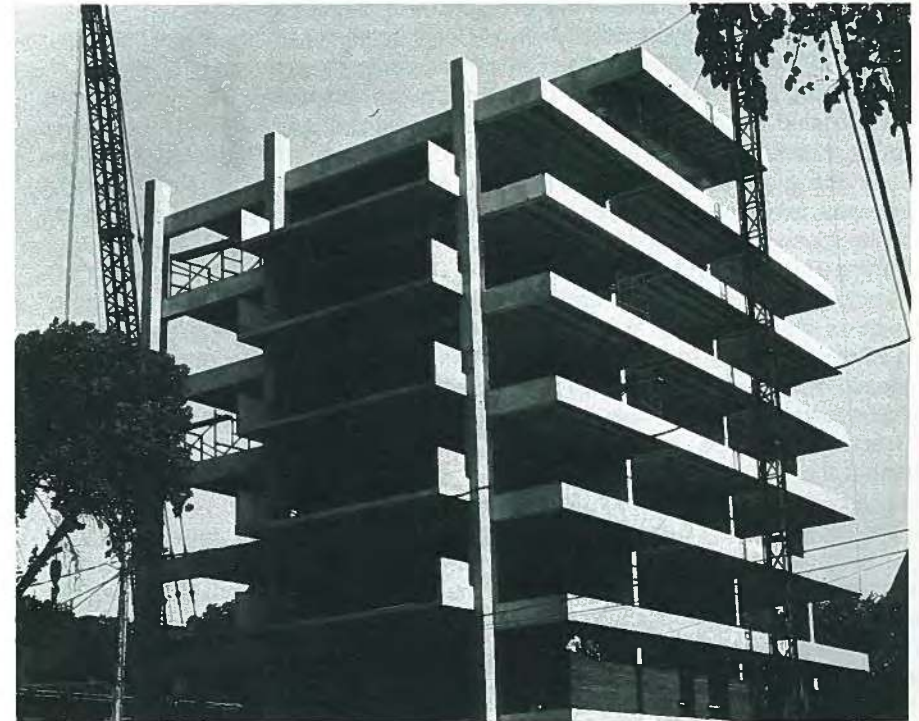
Grosvenor House in Winnipeg, tallest all-precast building in Canada at the time of its construction (1960).
